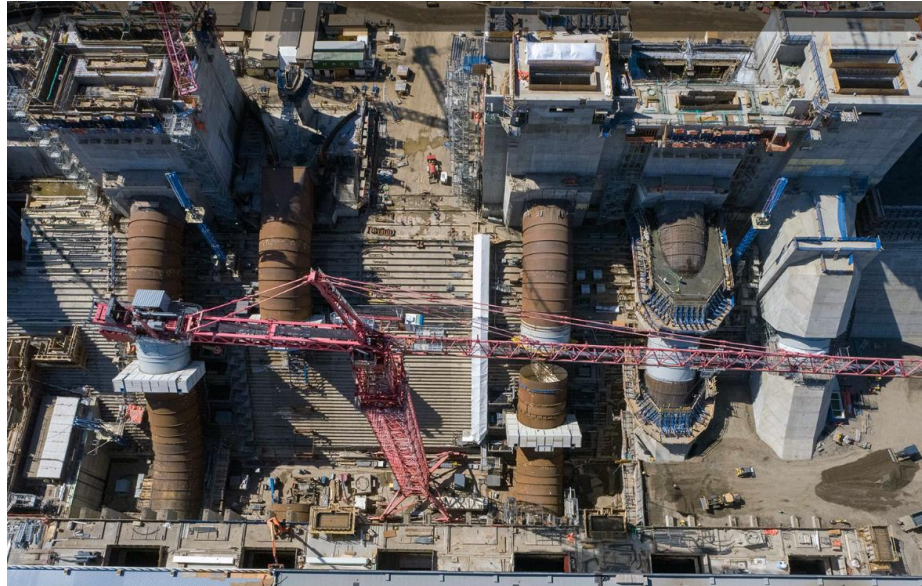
The first of four spiral case inlet bulkheads is delivered from the Voith warehouse at site to the powerhouse (August 2021)
